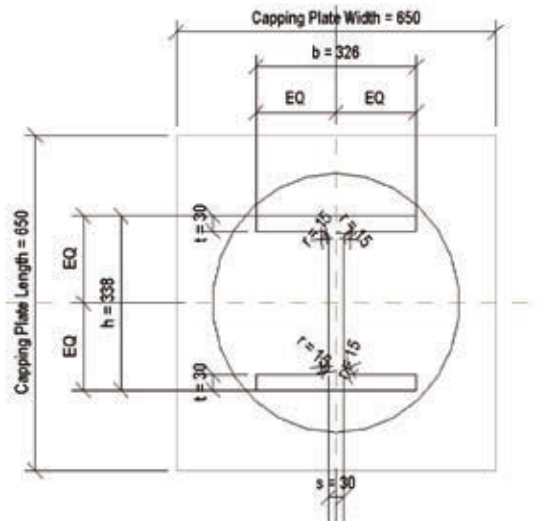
Plan View of Rock-Socketed H-Pile
